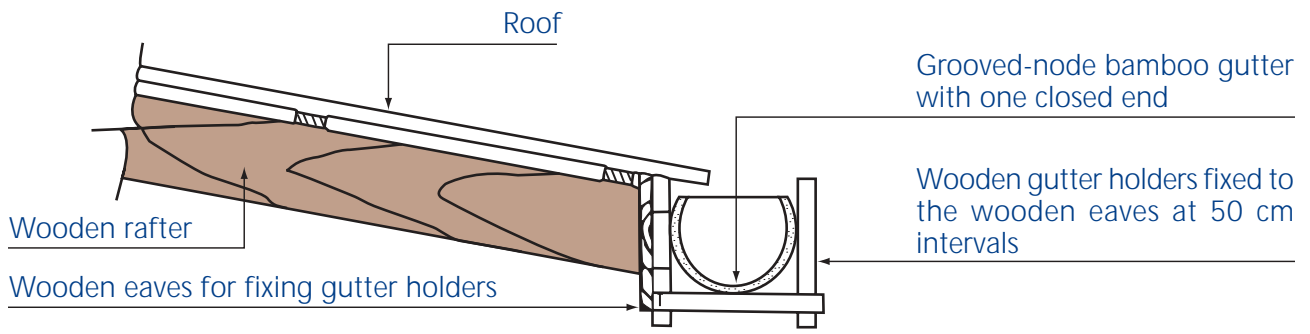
Fix the bamboo gutter to wooden roof structure using wooden eaves.
